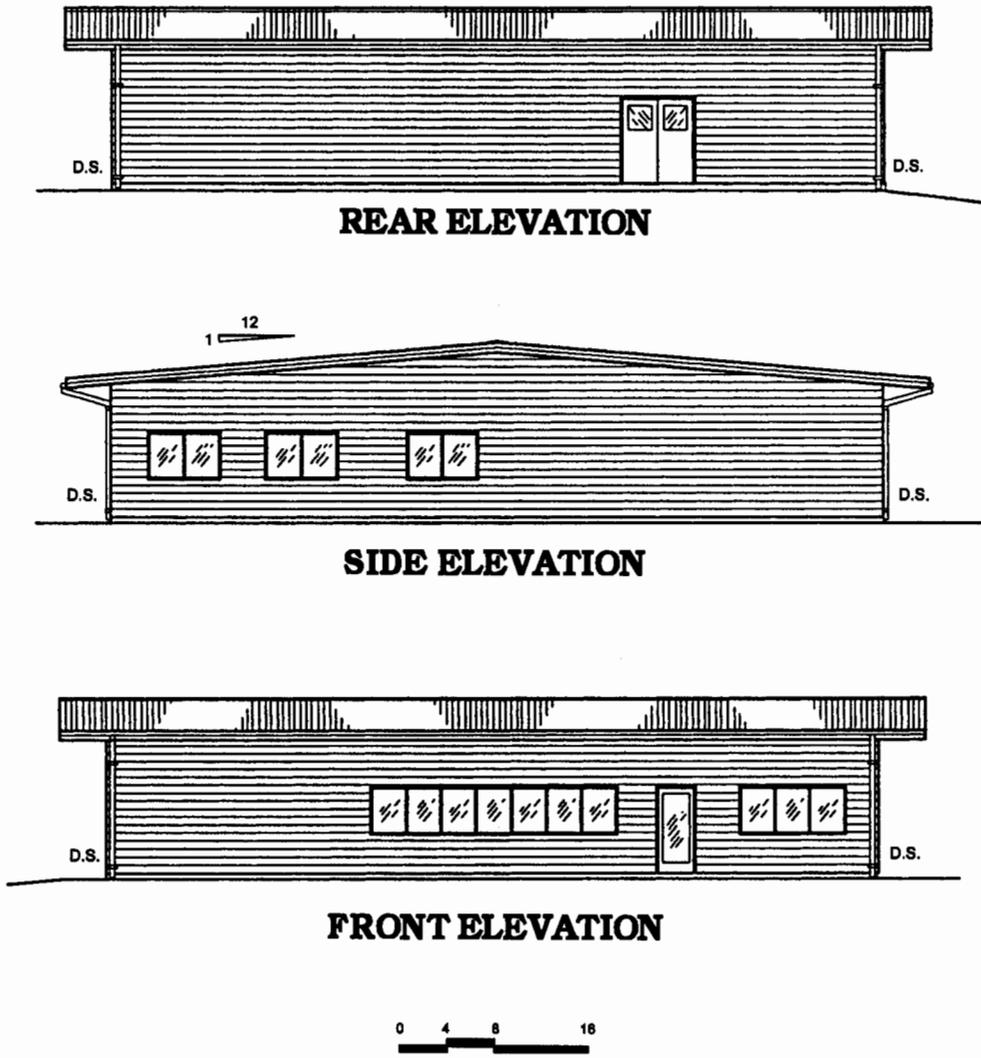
Elevation sketches of a potential concrete-masonry collections facility at Edwards AFB.
